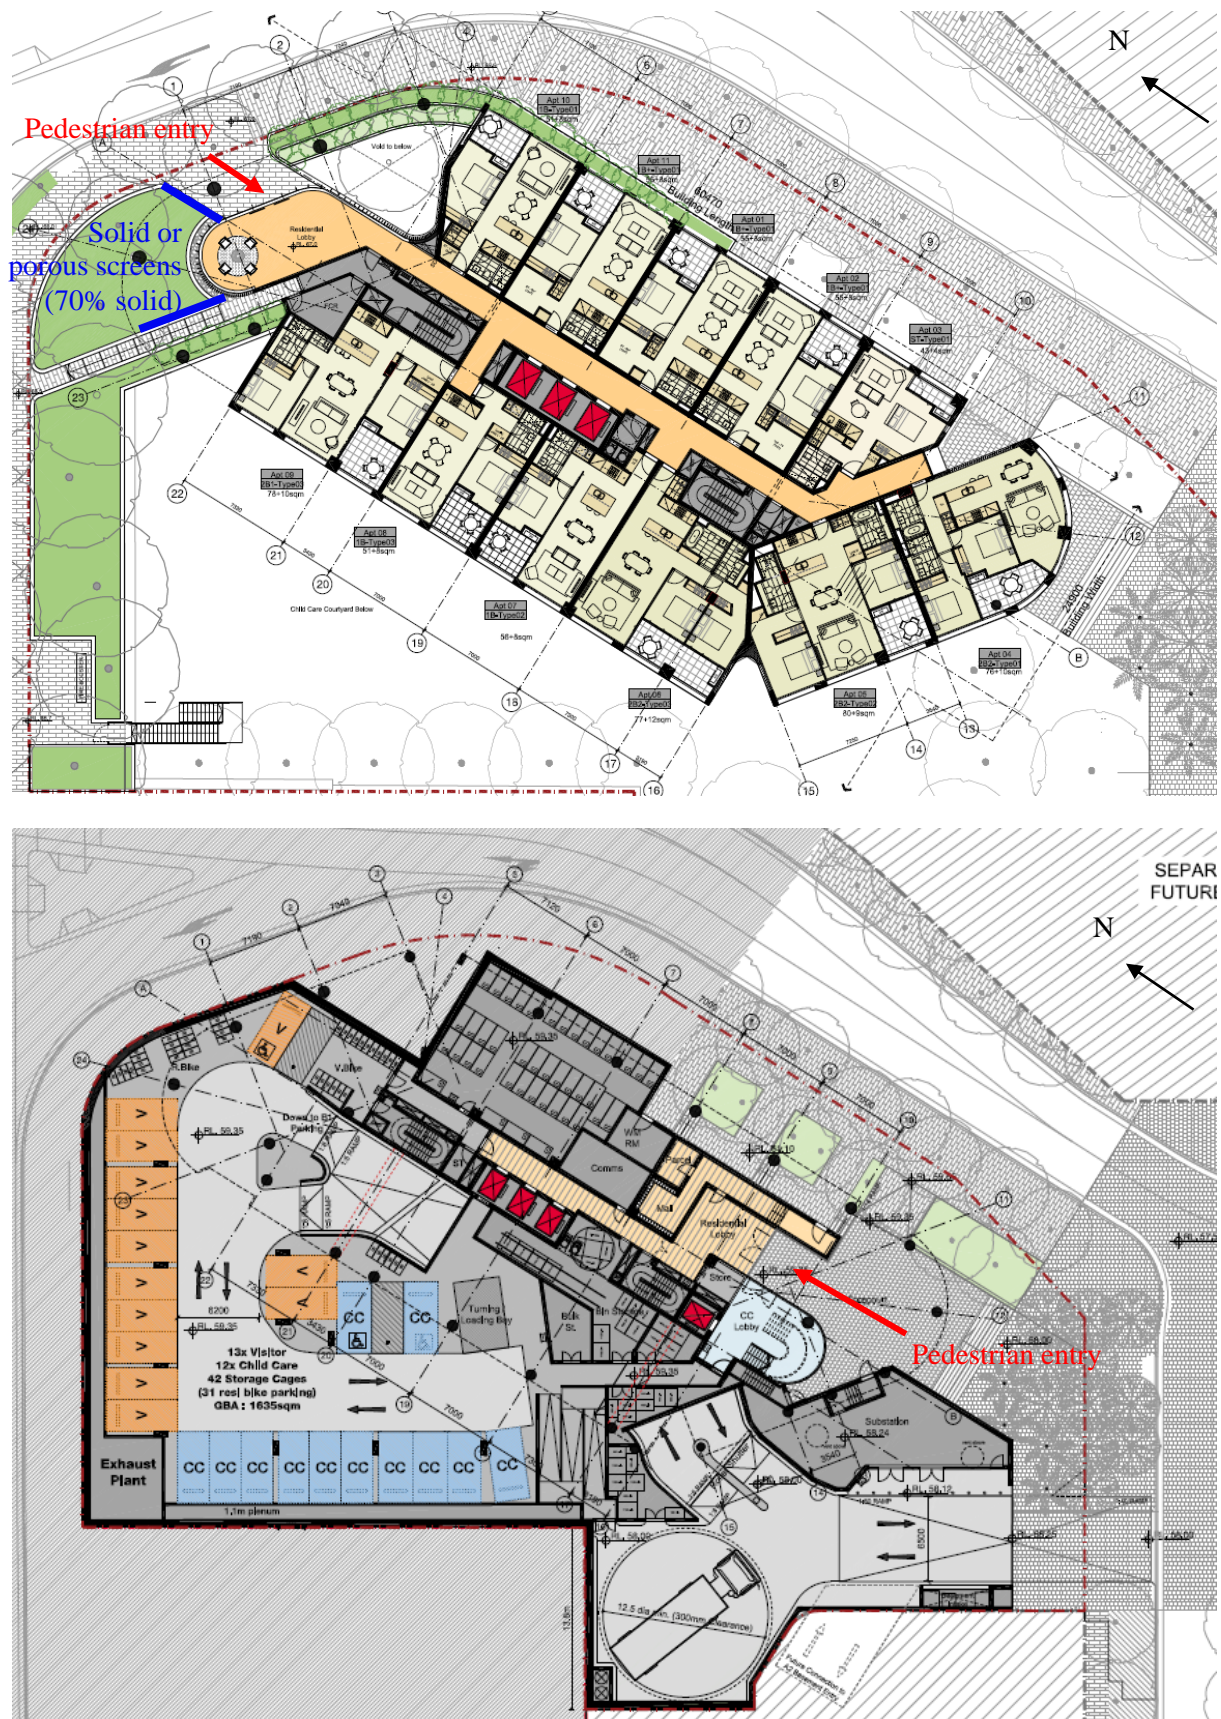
Level 01 (top) and Lower Ground (bottom) floor plan of Building A1.
